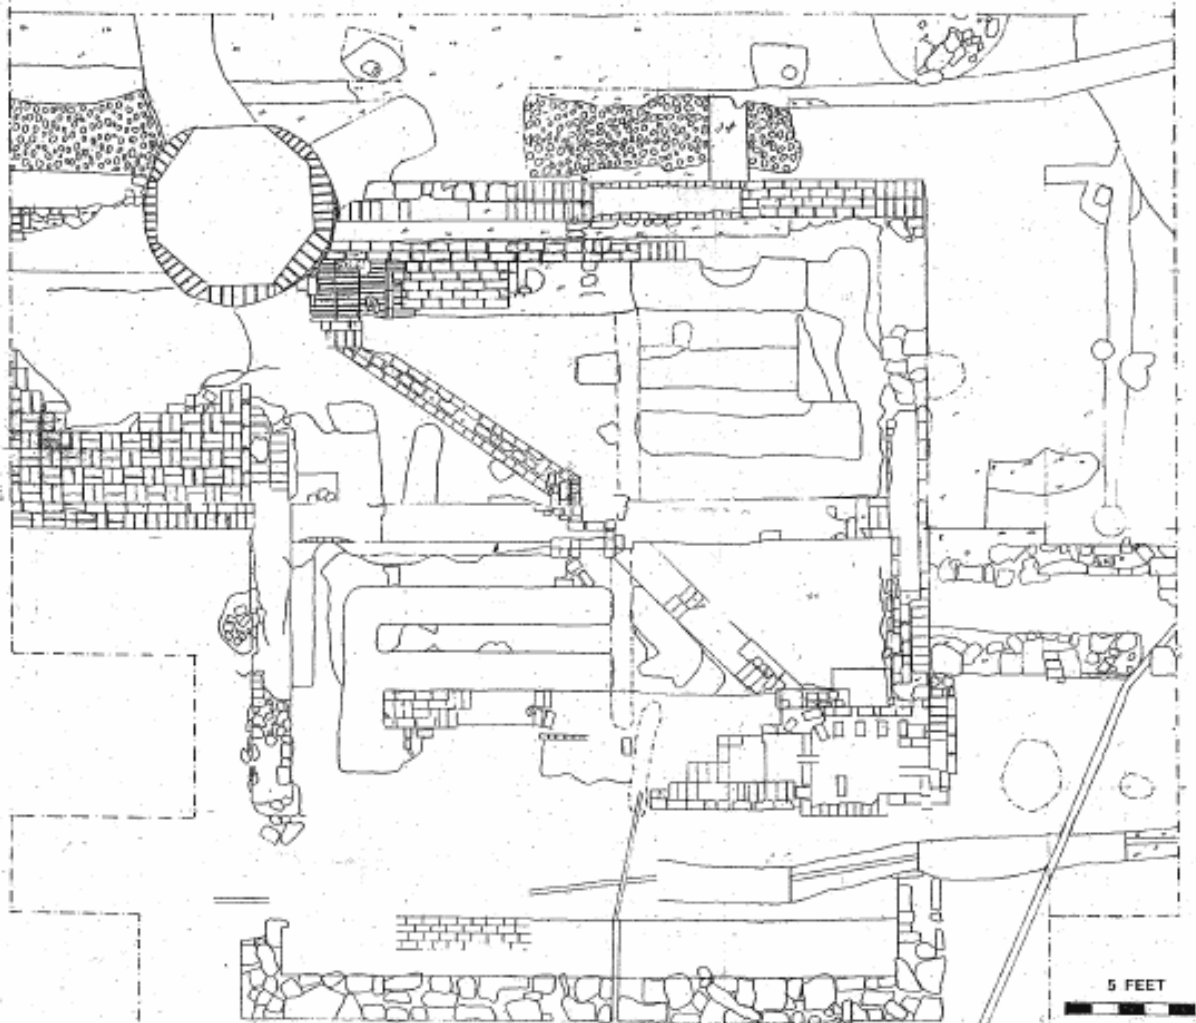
Plan View of Mount Clare Greenhouse – Archaeologists from the Mount Vernon Ladies’ Association exposed the entire foundation of the Greenhouse. It was built for Margaret Tilghman Carroll, who was known for her impressive gardening abilities. George Washington contacted the family himself to gather specifications and instructions on how it was built when he began constructing his own Greenhouse in 1784. Most notably are the foundation walls (shown as brick and stone), the adjoining well for irrigation (circular figure located top left), and the remnants of the hypocaust flue systems (‘F’ shaped image lower left corner inside foundation walls and corresponding image in upper right corner). Drawing courtesy of the Mount Vernon Ladies’ Association.
